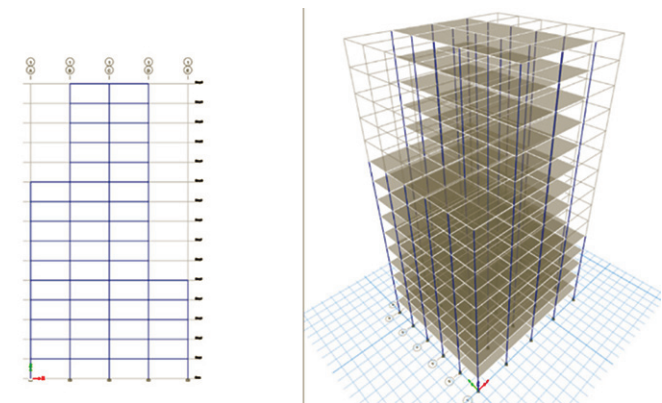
Views of the Vertical Geometric Irregular-4 Model in elevation and 3D for both composite and RC buildings
